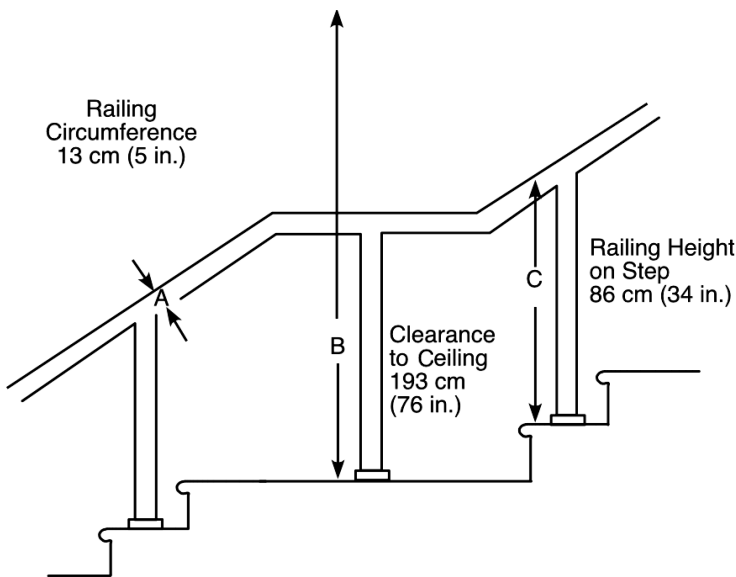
Handrail Design Guidelines (adapted from Thomson et al. 1963; U.S. Department of Defense 1998; Access Board 1998; Part 1910.24, “Fixed Industrial Stairs” 2001; Tilley 1993)
